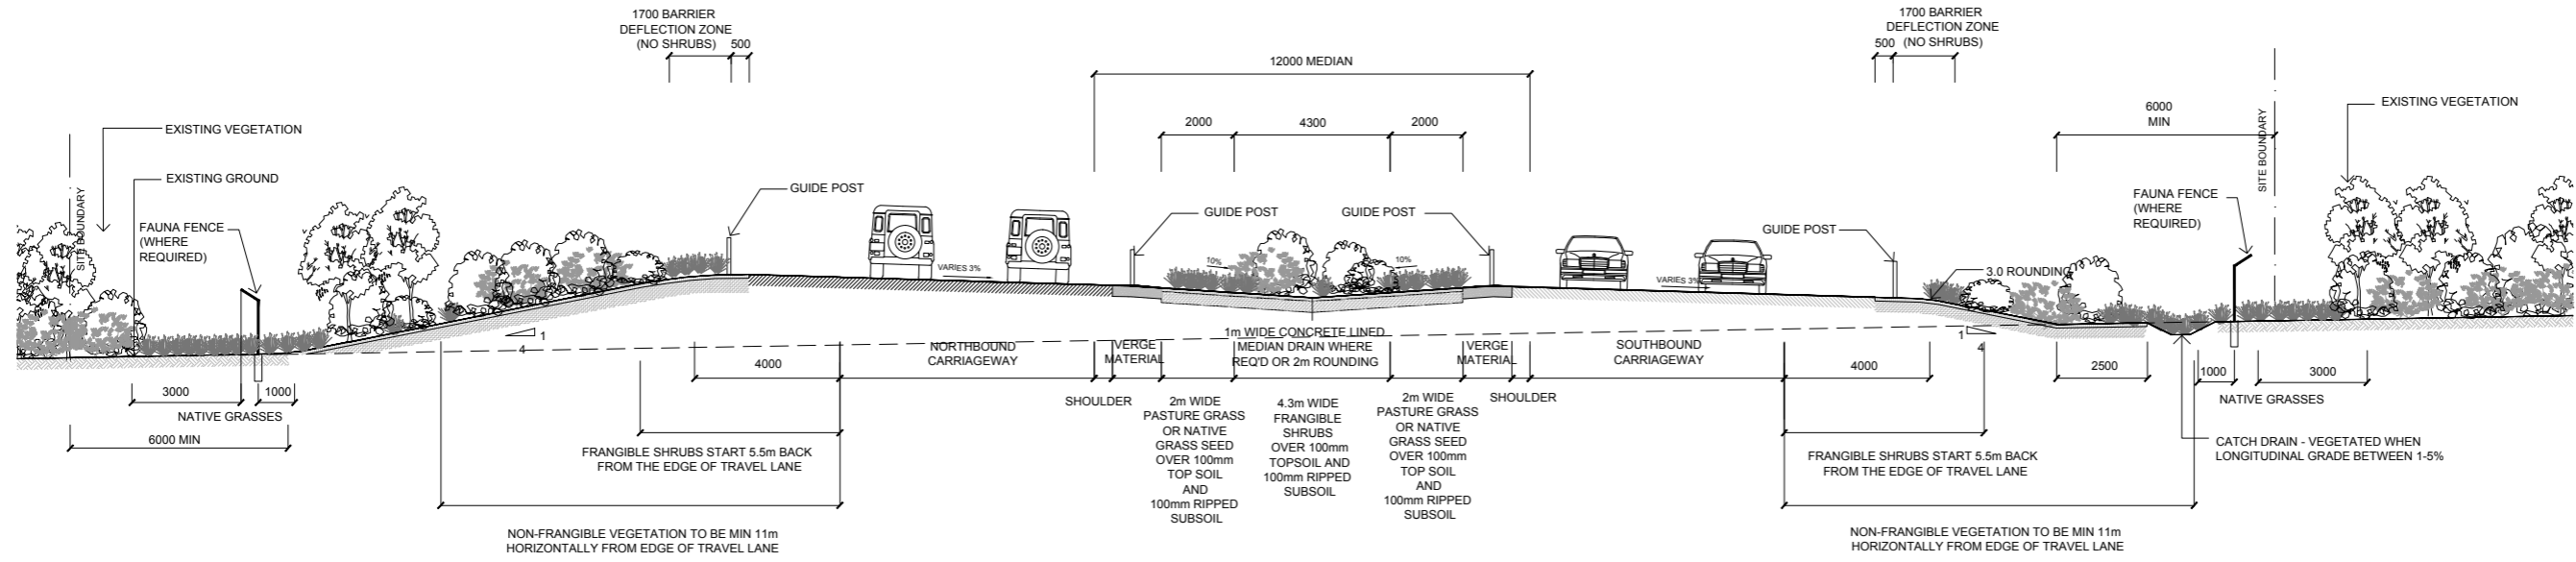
Typical Cross Section 3: Typical low fill < 2.5m high - on superelevation
